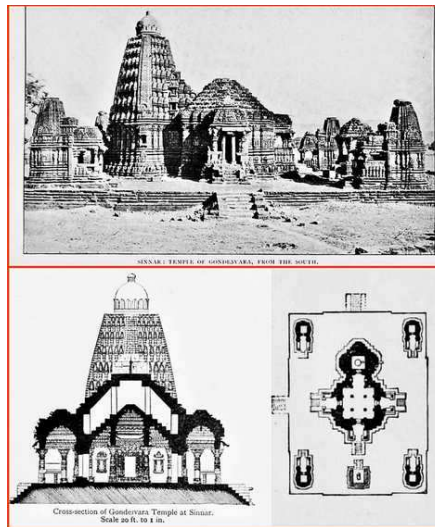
Nashik Maharashtra temple, cross section and plan (1910 sketch)
